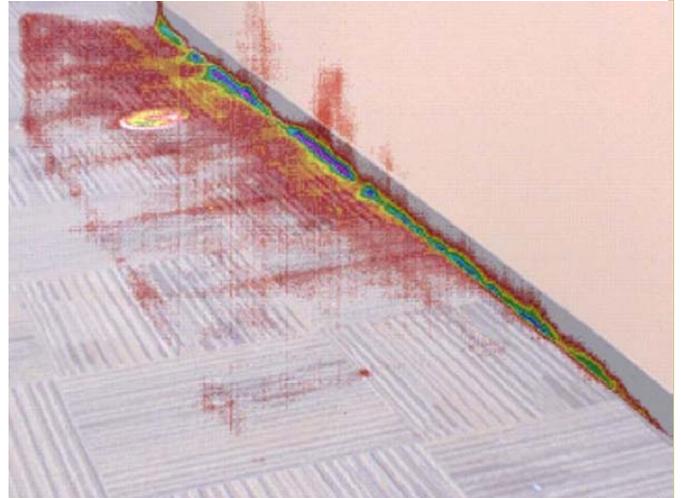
Floor to wall joint is leaking the entire length of the UFAD system
